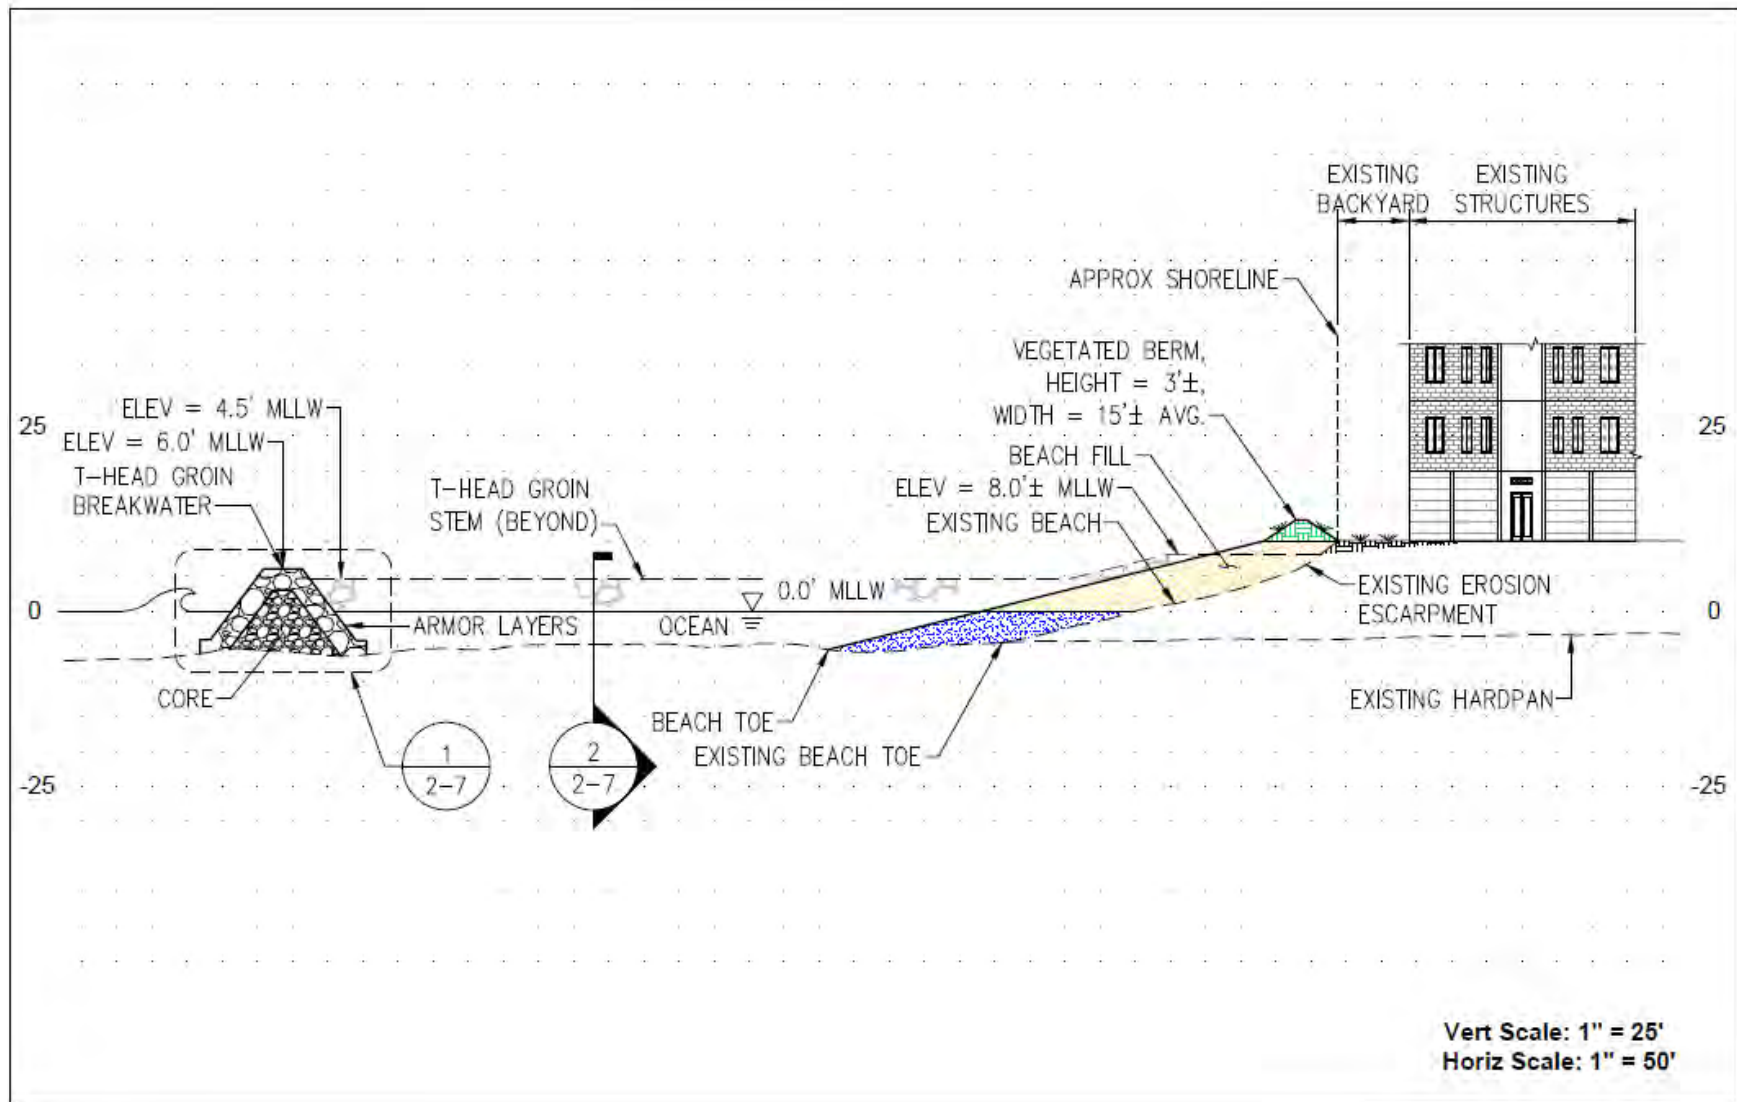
Typical Profile of Proposed Action: Beach Nourishment with Stabilizing Structures
